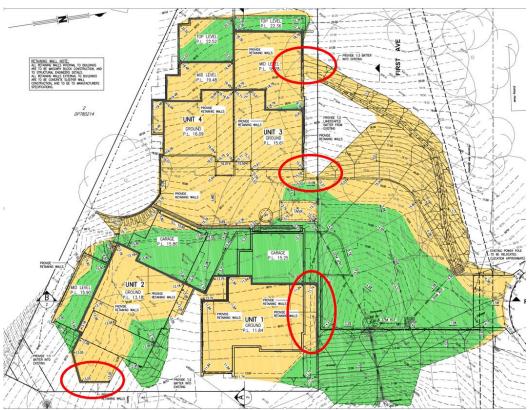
Location of retaining walls/batters less than specified distance from boundary.
